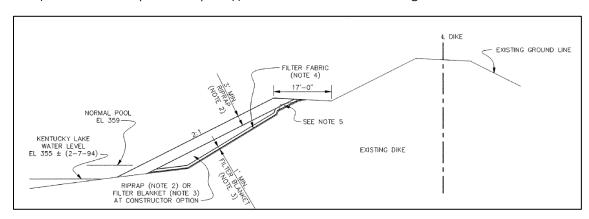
Typical Erosion Protection, Northwest Perimeter Dike (Drawing No. 10W527-1)
